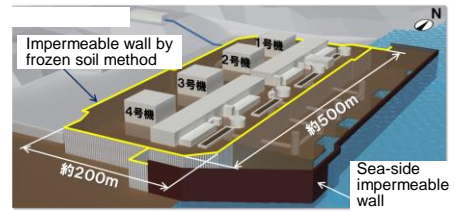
(3): Large-scale verification of impermeable walls (ice wall)
